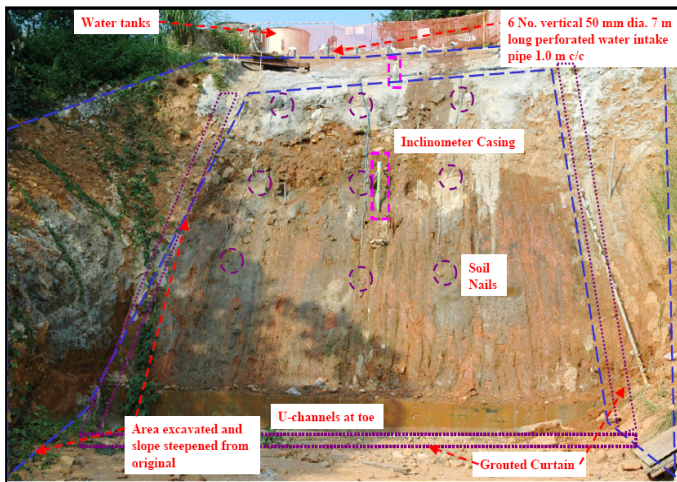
Overall view of cut slope with soil nails and inclinometers installed.
